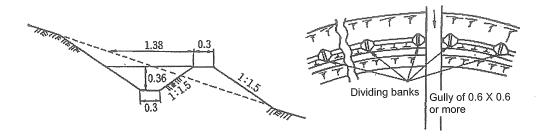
Example of Contour Line Trench Work (unit: m)
